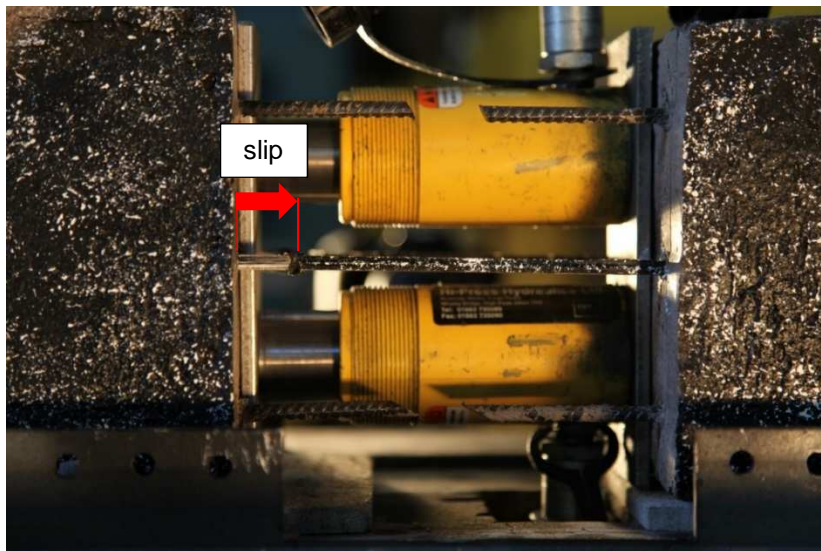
Pull-out failure of specimen with hooked reinforcement (specimen H6 at 130°C).
